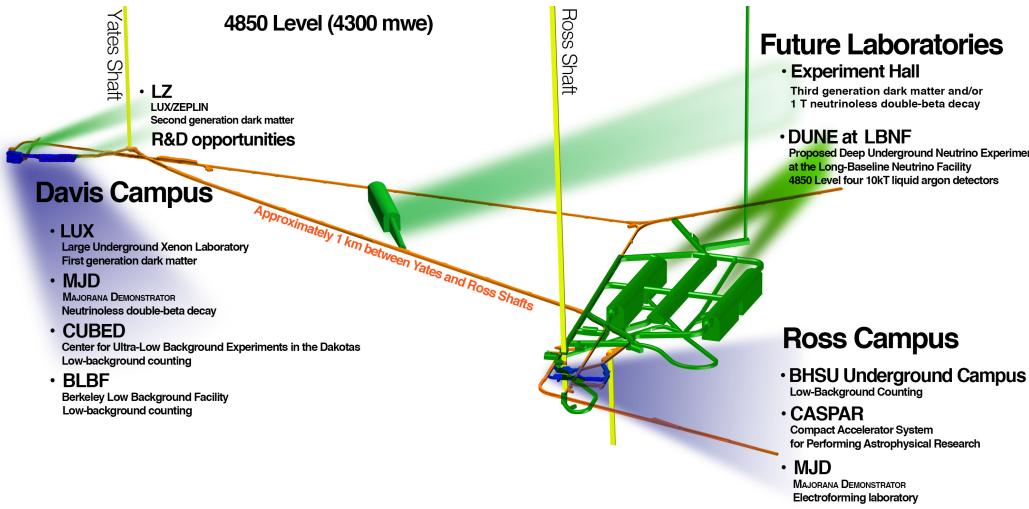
Underground cavern layout (SRK, Courtesy SURF)
